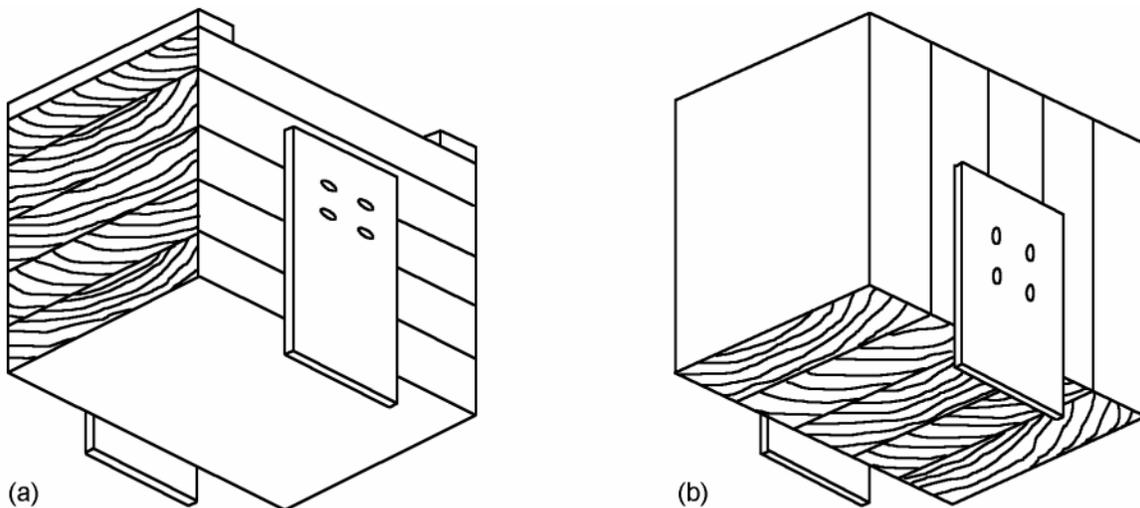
Small specimens for (a) perpendicular-to-grain and (b) parallel-to-grain loadings.
